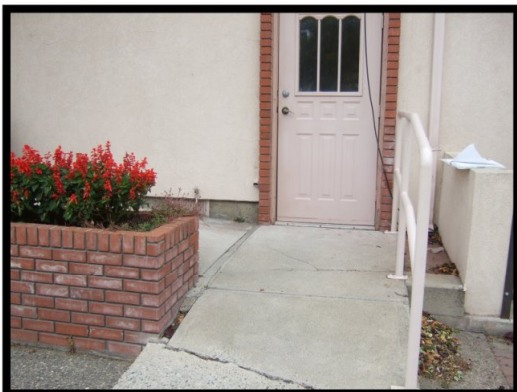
Town Hall – Upper portion of ramp leading to Council Chambers
